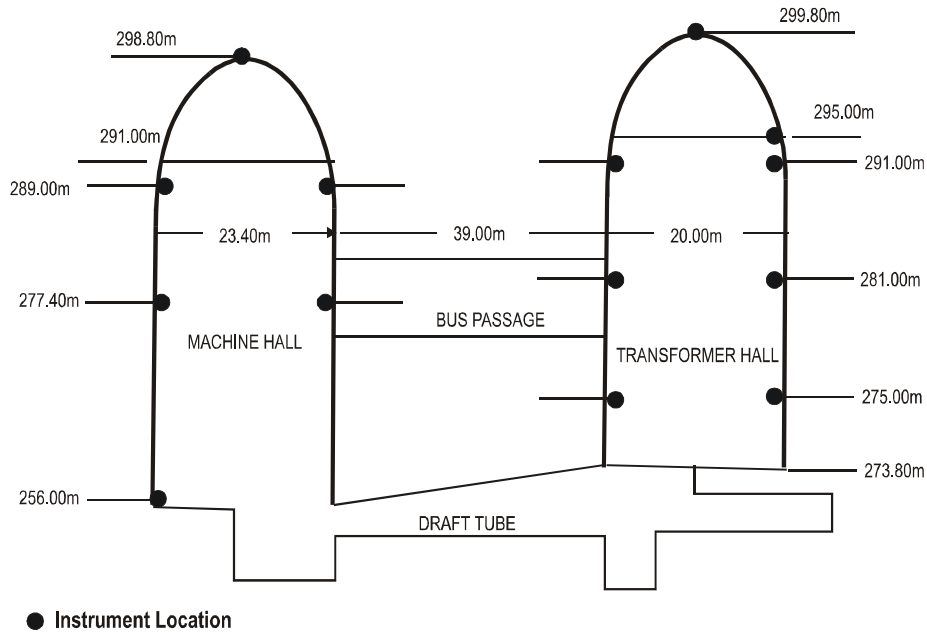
Cross-section of cavern openings with instrument locations at different RL
